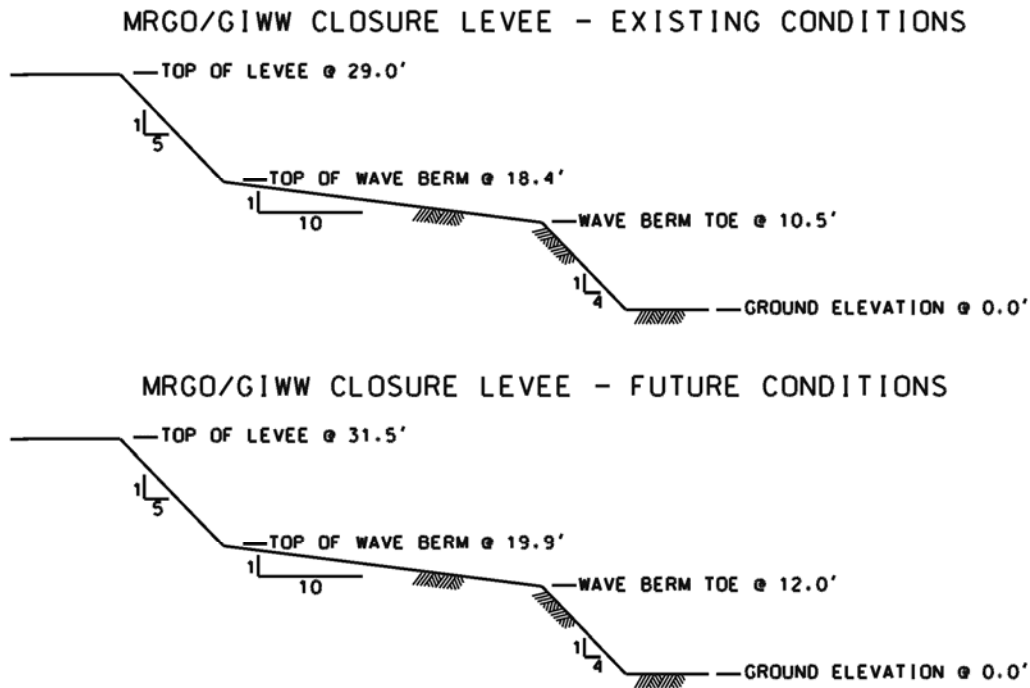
Typical Levee Design Cross-Section – Levee Closure (Levee Gate A1) for existing (upper panel) and future conditions (lower panel).
